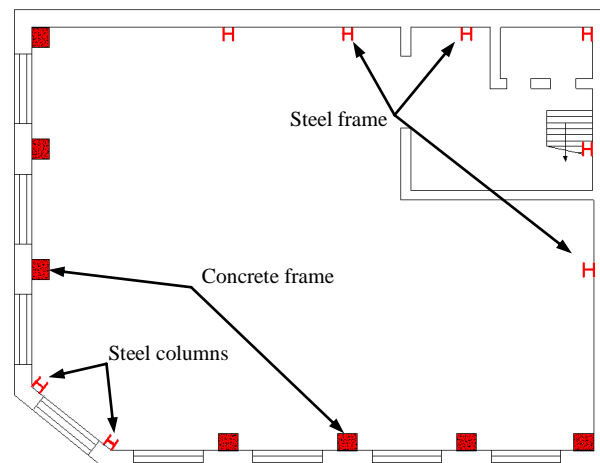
Floor plan of TSB Bank Building, showing retrofit.
